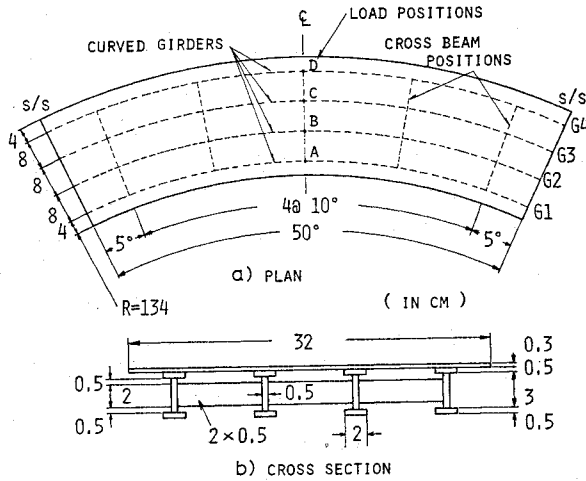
A Curved Girder Bridge Model (EX. 2)
